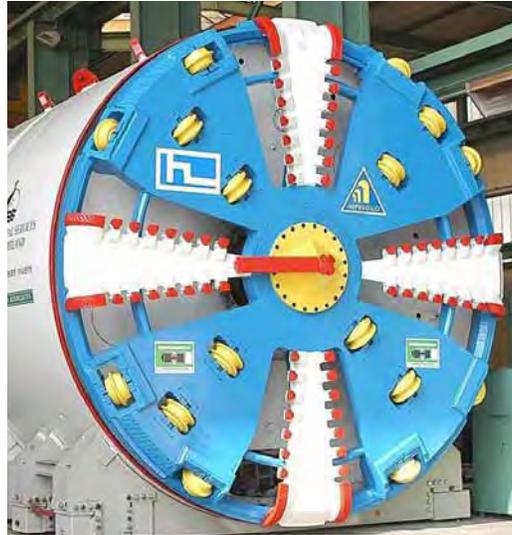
Slurry Face Tunnel Boring Machine (SFM) (courtesy of Herrenknecht).
